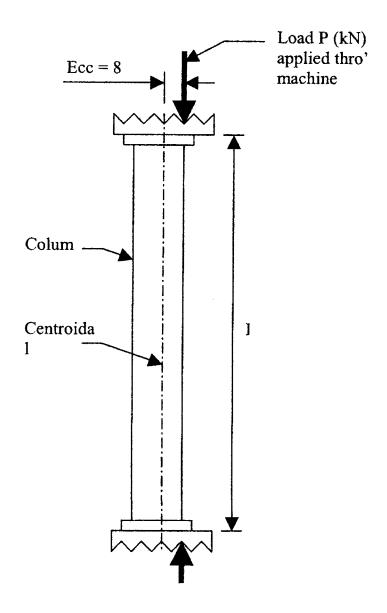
Schematic Diagram of Eccentrically Loaded Column Test
